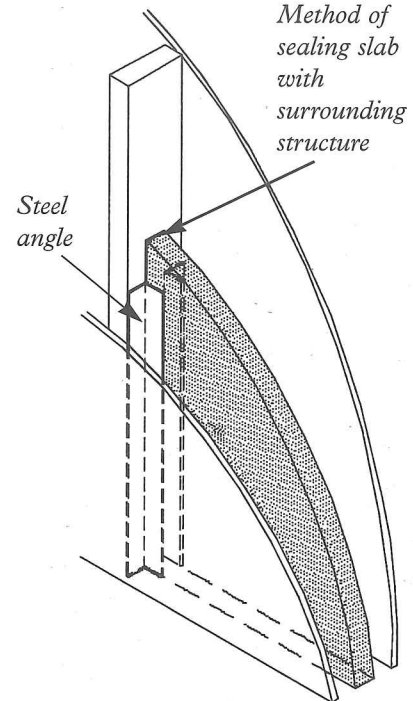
(above) Intumescent coated mineral wool slabs used to upgrade a partition
